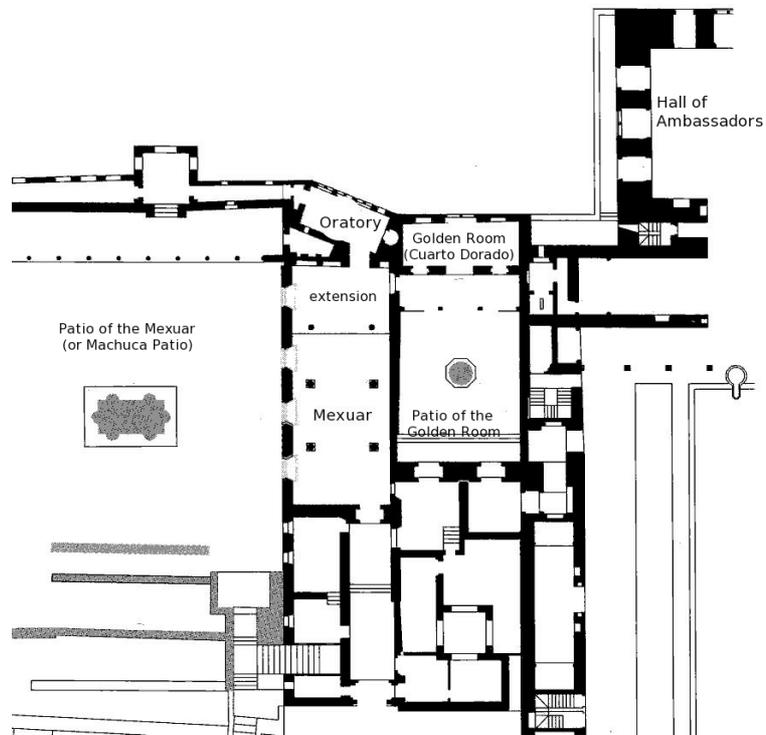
Floor plan of the Mexuar Hall and adjacent spaces.
